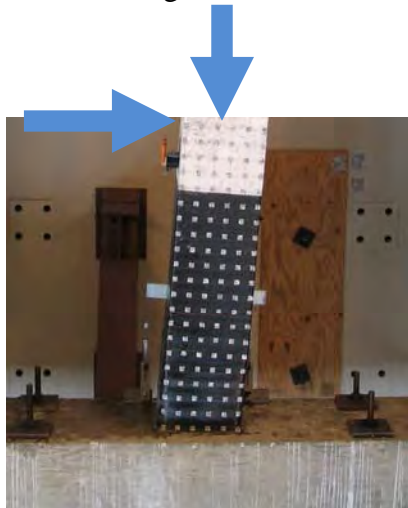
Hinge zone with CFRP jacketing under constant axial load (RC-1R Top Half)
